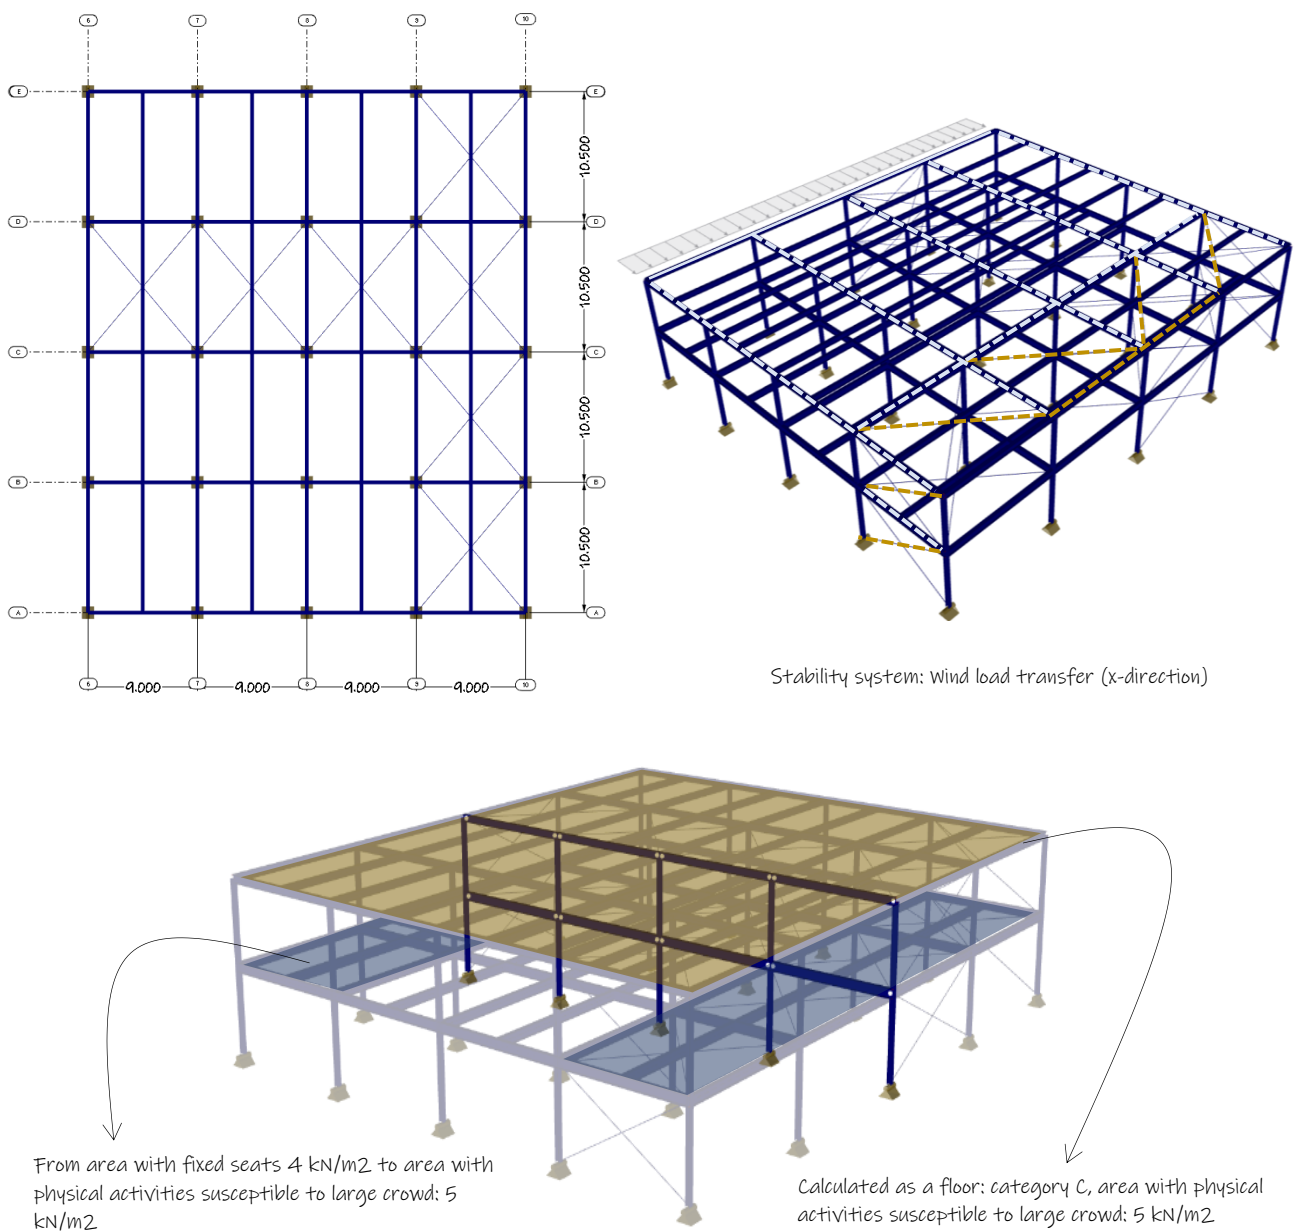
Demountable Convertible design conceptual structural overview: floor plan, and stability system and structural consideration on surplus capacity.
